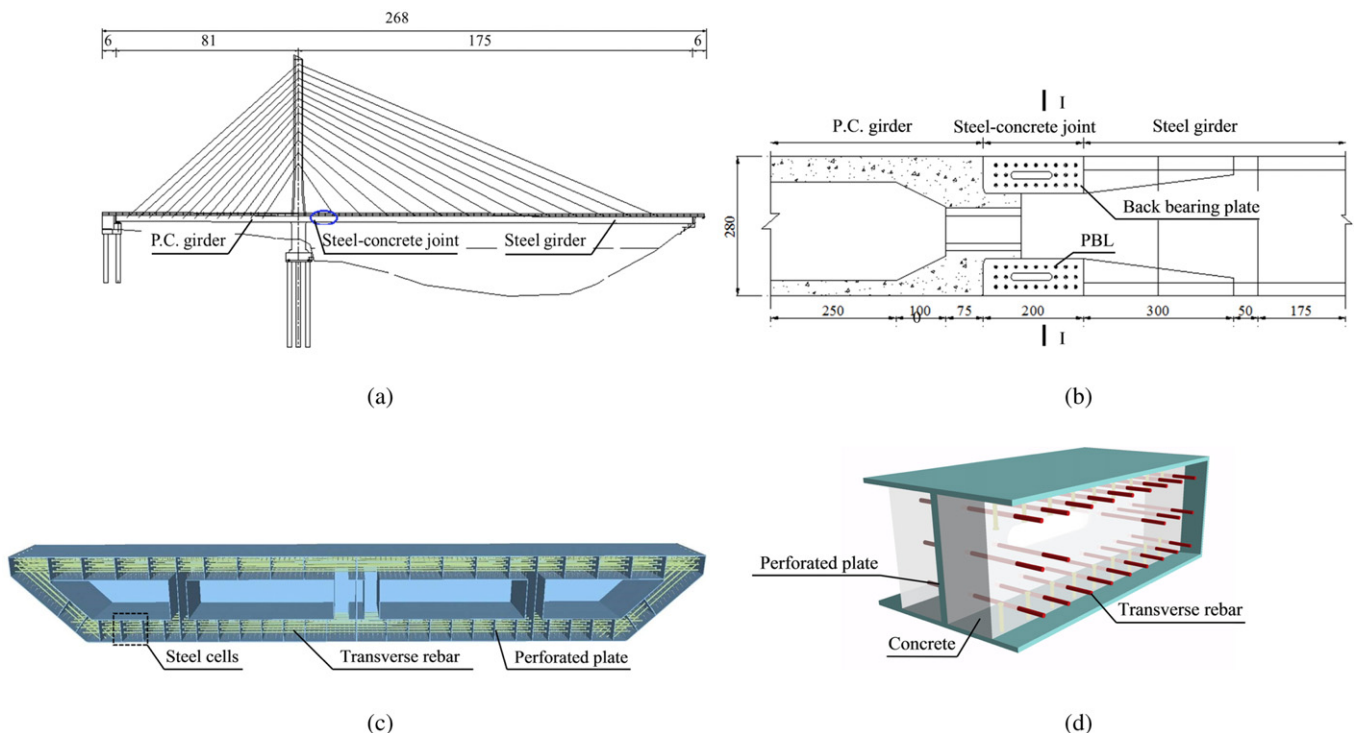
Nujiang bridge: (a) Elevation view (unit: m); (b) Steel–concrete joint part (unit: cm); (c) Section of I–I; (d) PBL connectors in the steel cells.
